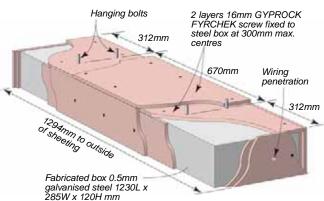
RECESSED LIGHT BOX IN SUSPENDED STEEL FRAME CEILING
